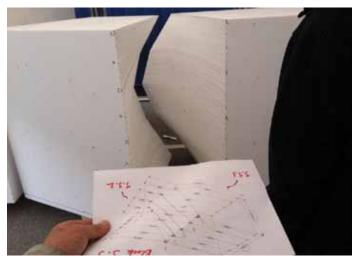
Gross machining of 1200 x 1400 x 4800 mm. EPS blocks was initiated using a hot-wire cutter to produce smaller blocks that were then cut into two halves representing rough versions of the inner and outer formwork. The formwork surfaces were then robotically milled based on the geometries in the digital model (including drilling of holes for the tie-rods)
